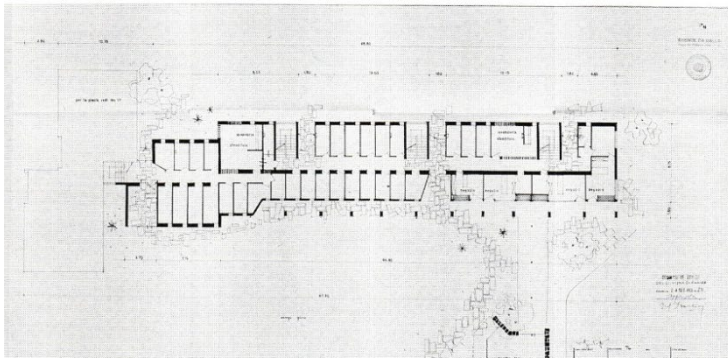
Plan of the Trieste neighbourhood and groundfloor plan of a residential building
